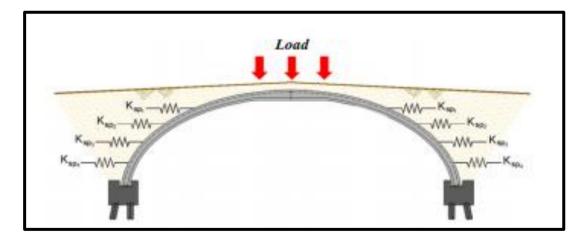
Soil-structure Interaction in Precast Concrete Closed Spandrel Arch Bridge (Ong et al., 2014)
